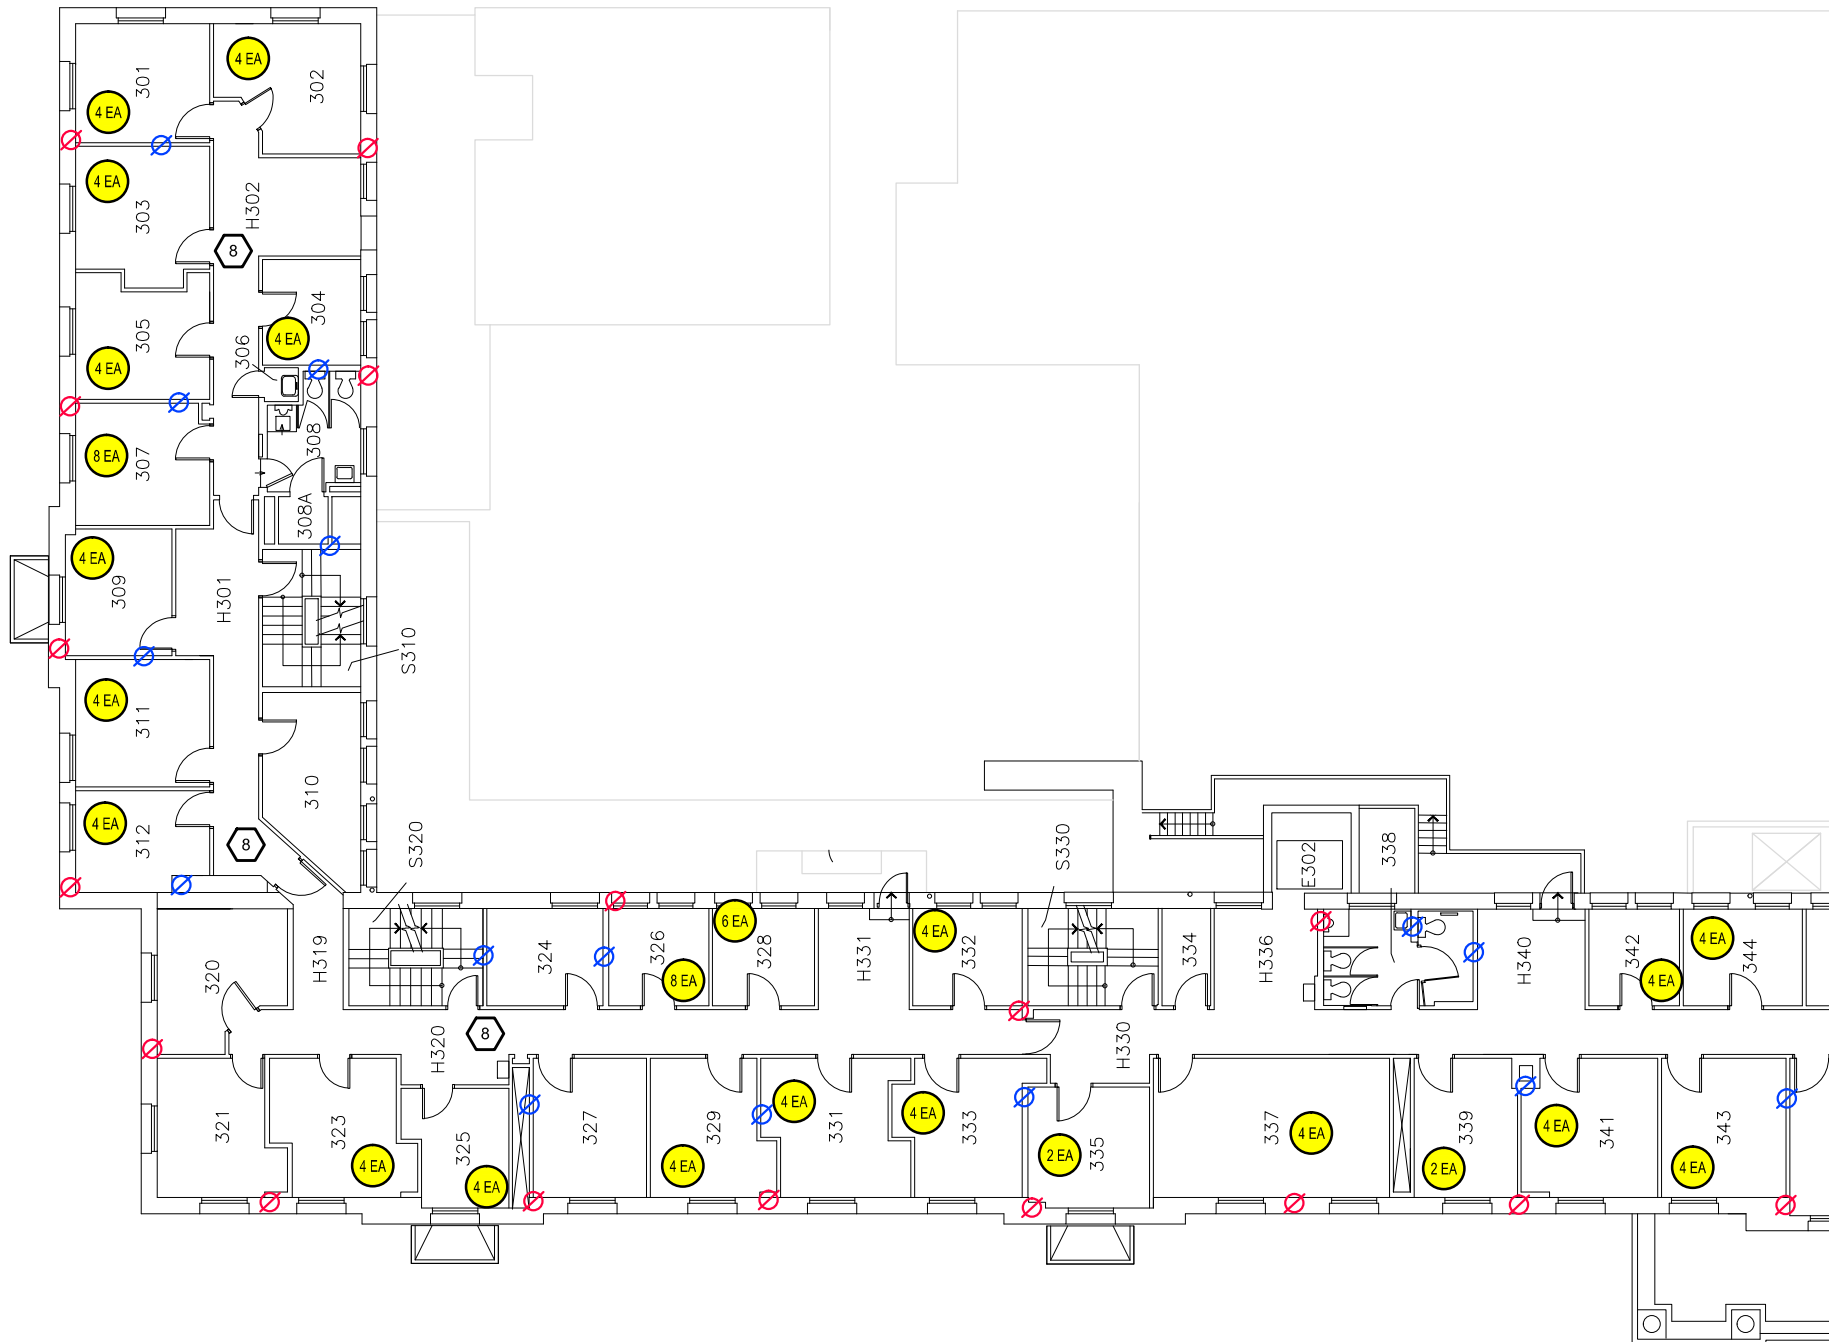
STRAUB HALL - THIRD FLOOR - NORTH HALF
